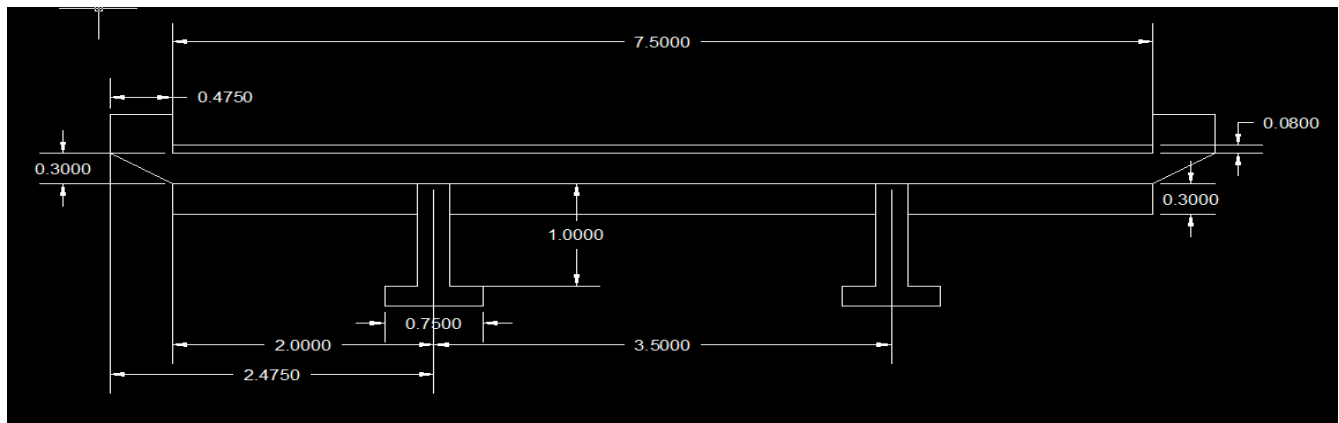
PSC I GIRDER BRIDGE TRANSVERSE SECTION
